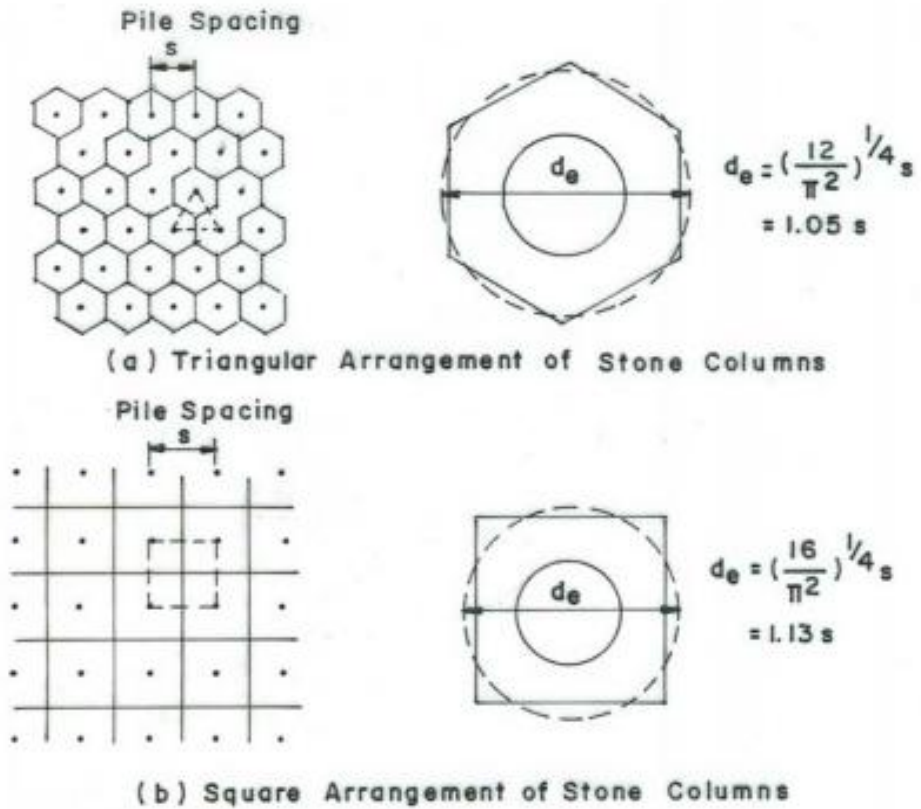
Typical layout of stone columns (a) Triangular grid arrangement (b) Square grid arrangement (after Balaam and Booker, 1981).
